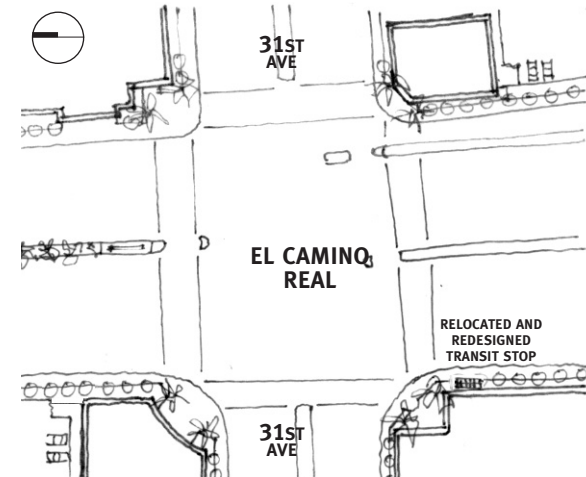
Potential private redevelopment at the 31st Avenue intersection, including additional sidewalk width, landscape setbacks, expanded corner plazas and redesigned transit stops.
